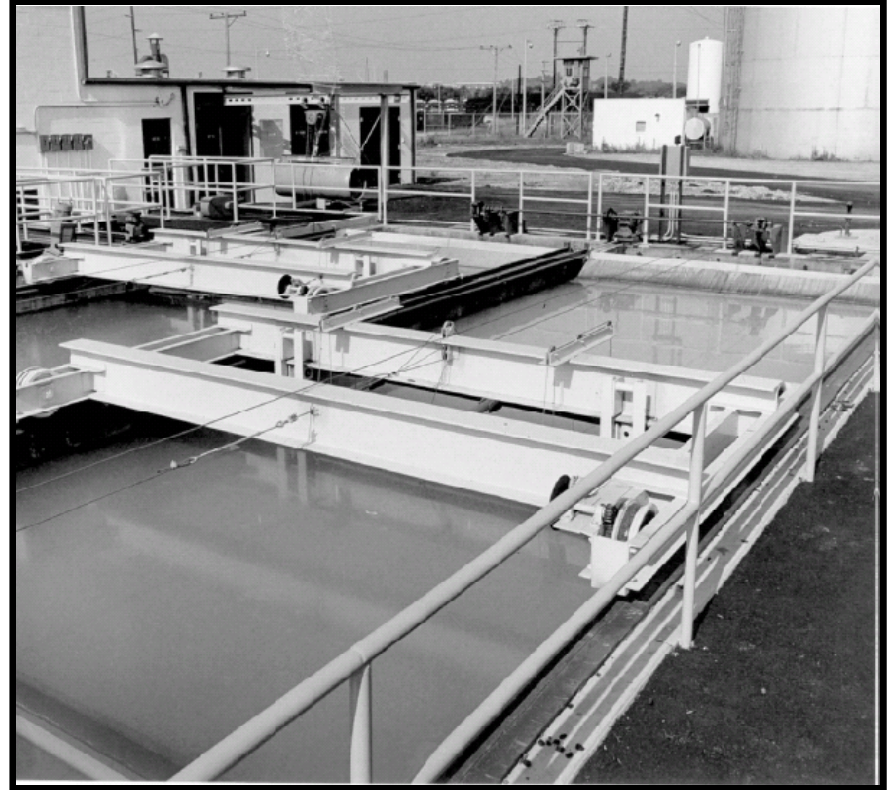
March 20, 1973 photo. View looking east to northeast from west side of new settling basins. Asphalt pavement is present around tanks.
